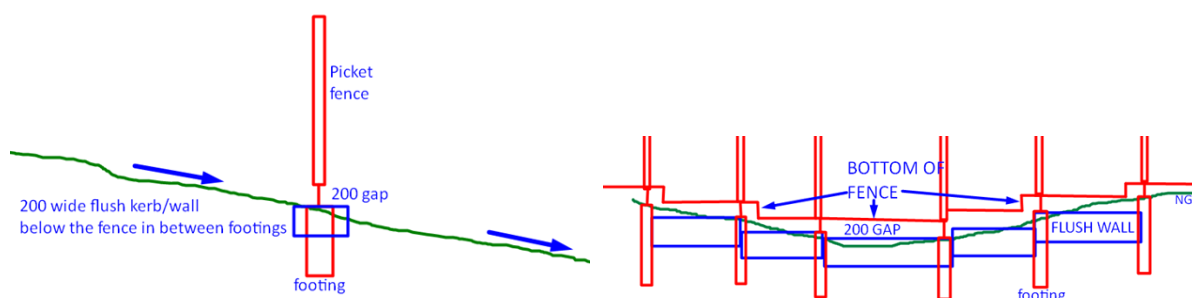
Typical section of 200 wide flush kerb/wall below flow through fencing (left) and fence elevation (right)
